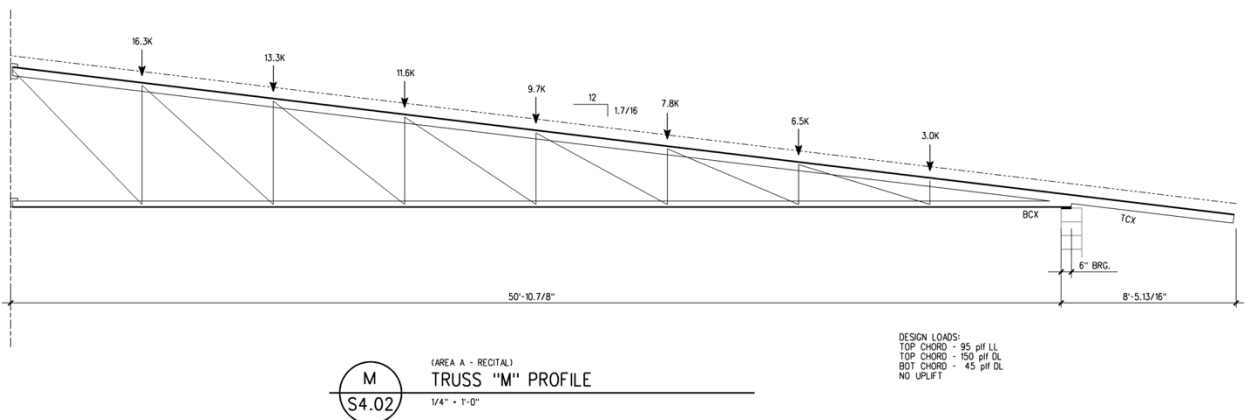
Truss M Profile from CFAC Roofs 2 and 3.
